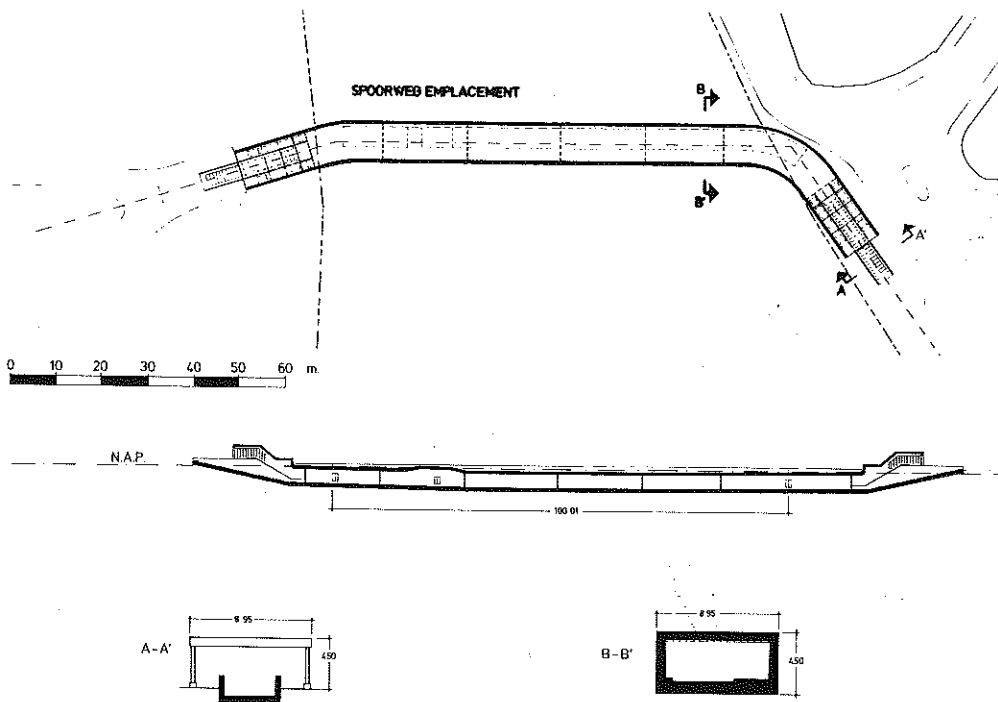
Map, cross-section and longitudinal section of the tunnel
